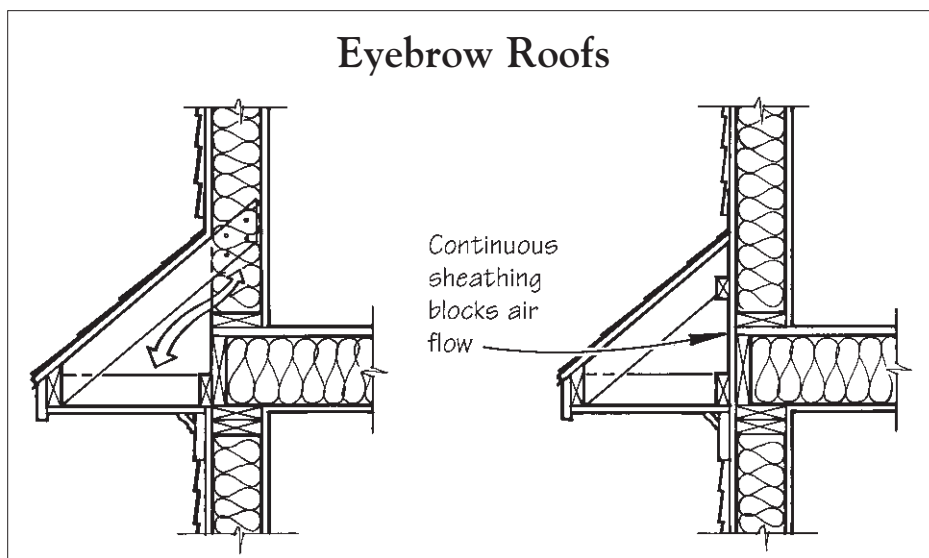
Eyebrow roofs, if built wrong (left), can allow cold air to penetrate exterior walls and leak out the ends of the building. When building an eyebrow roof on a shed dormer, sheathe the exterior wall first, then attach the rafter tails to a ledger (right).
